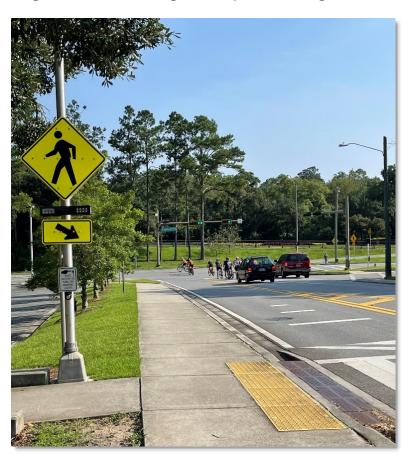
Rectangular Rapid Flashing Beacons
